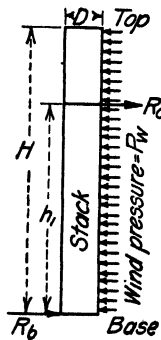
Horizontal forces acting on a guyed steel stack with one set of guys.
